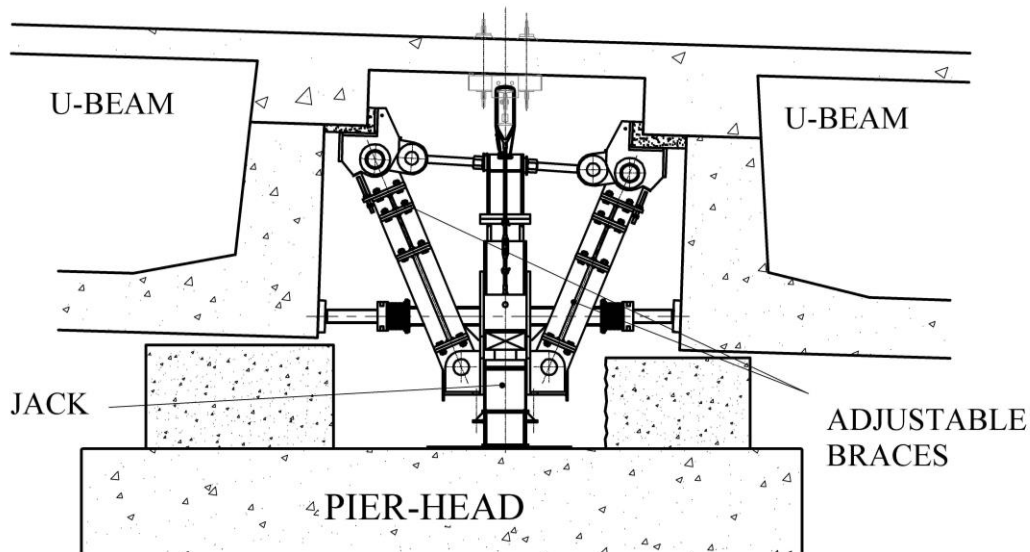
, – Longitudinal section at the pier head, showing the jacking system to re-center the bridge
